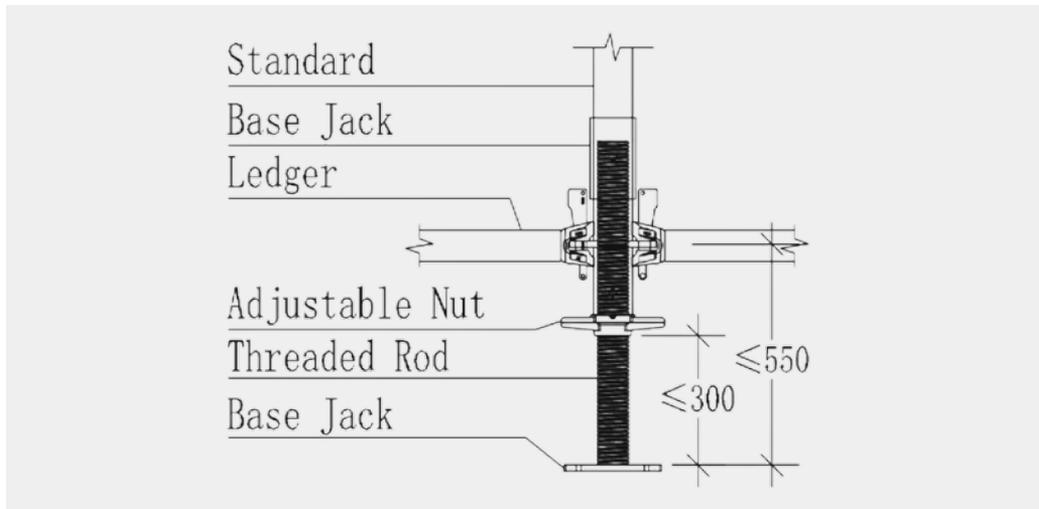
Adjustable Base Jack Installation Diagram
